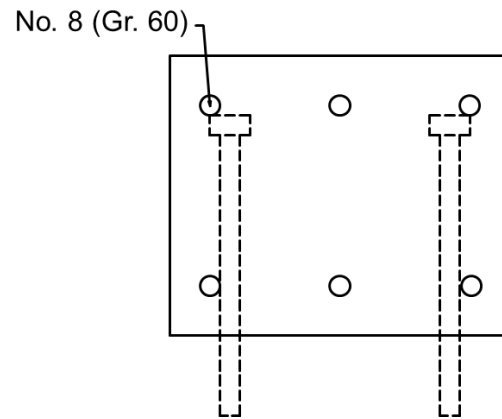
Layout B6: 6 No. 8 (Gr. 60)
